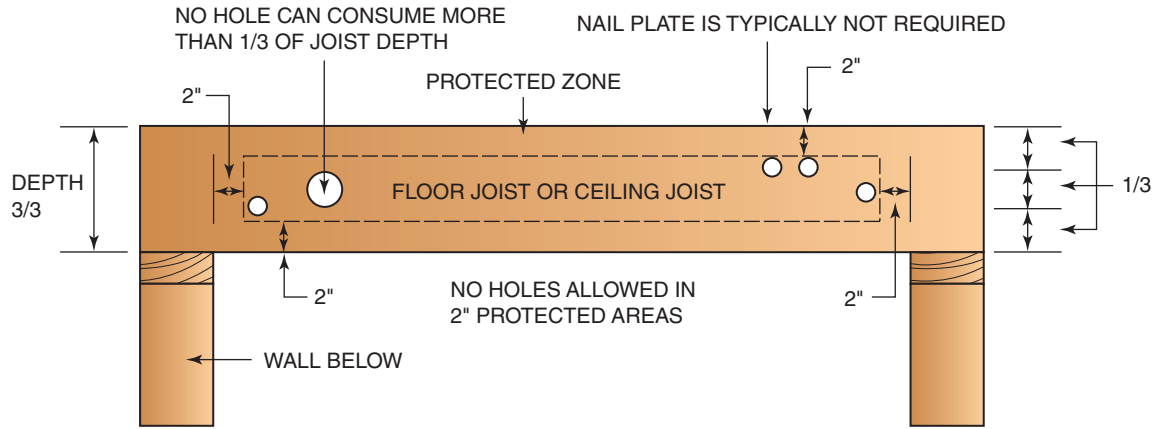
Some codes dictate that a 2" protected zone be created when drilling holes in a floor or ceiling joist.
